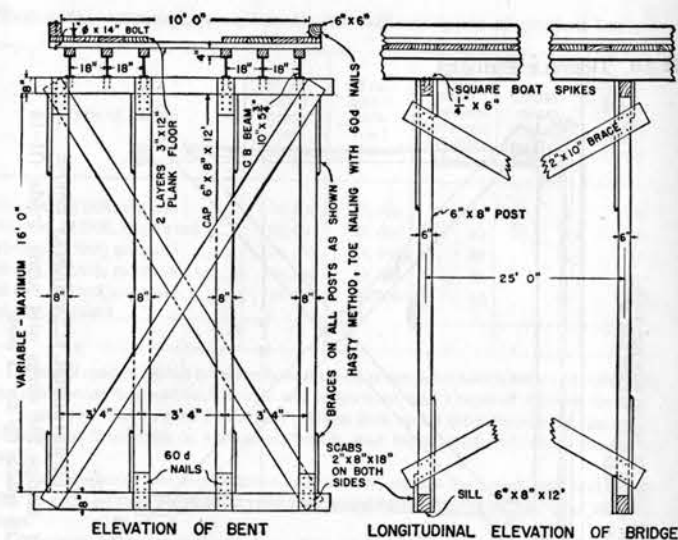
Multiple short span (nonfloating) bridge for corps and army loads (H-15 loading). Steel stringers in spans up to 25 feet.
